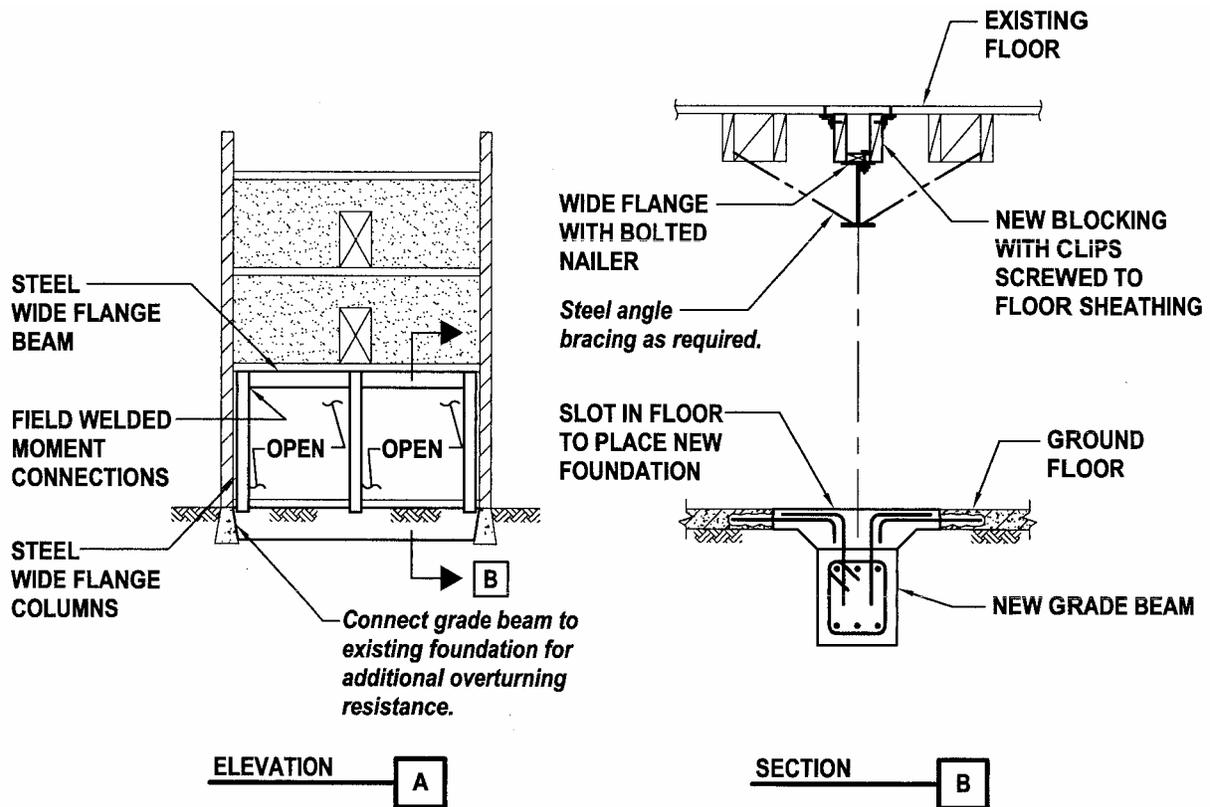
Add New Moment Frame as Crosswall
